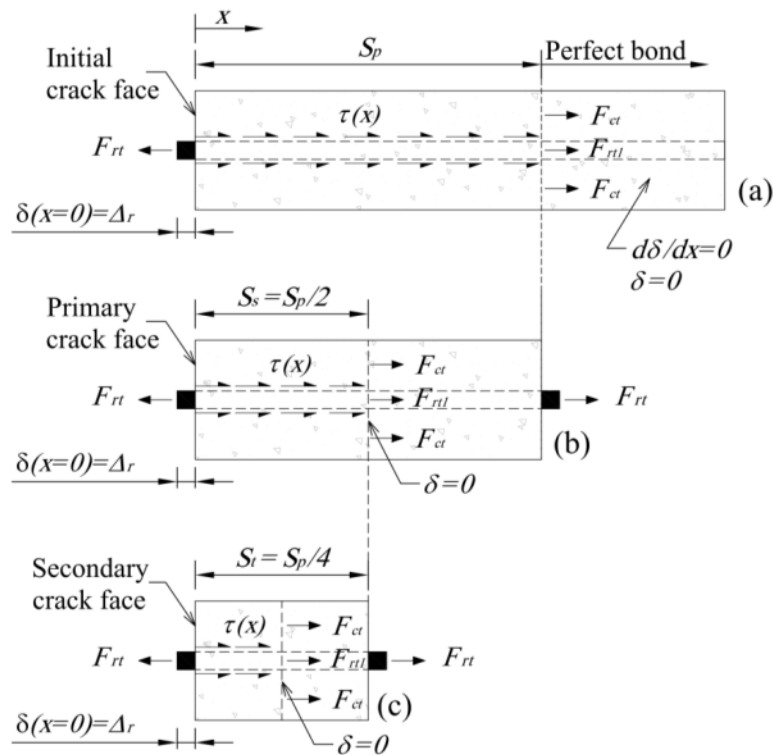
Tension stiffening mechanism in a reinforced concrete prism
